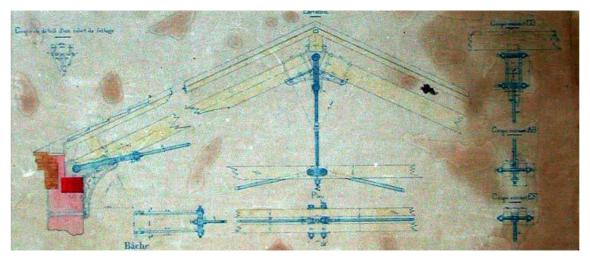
6. Feriköy Water Pump Station Truss System (Kaya, 1998)
